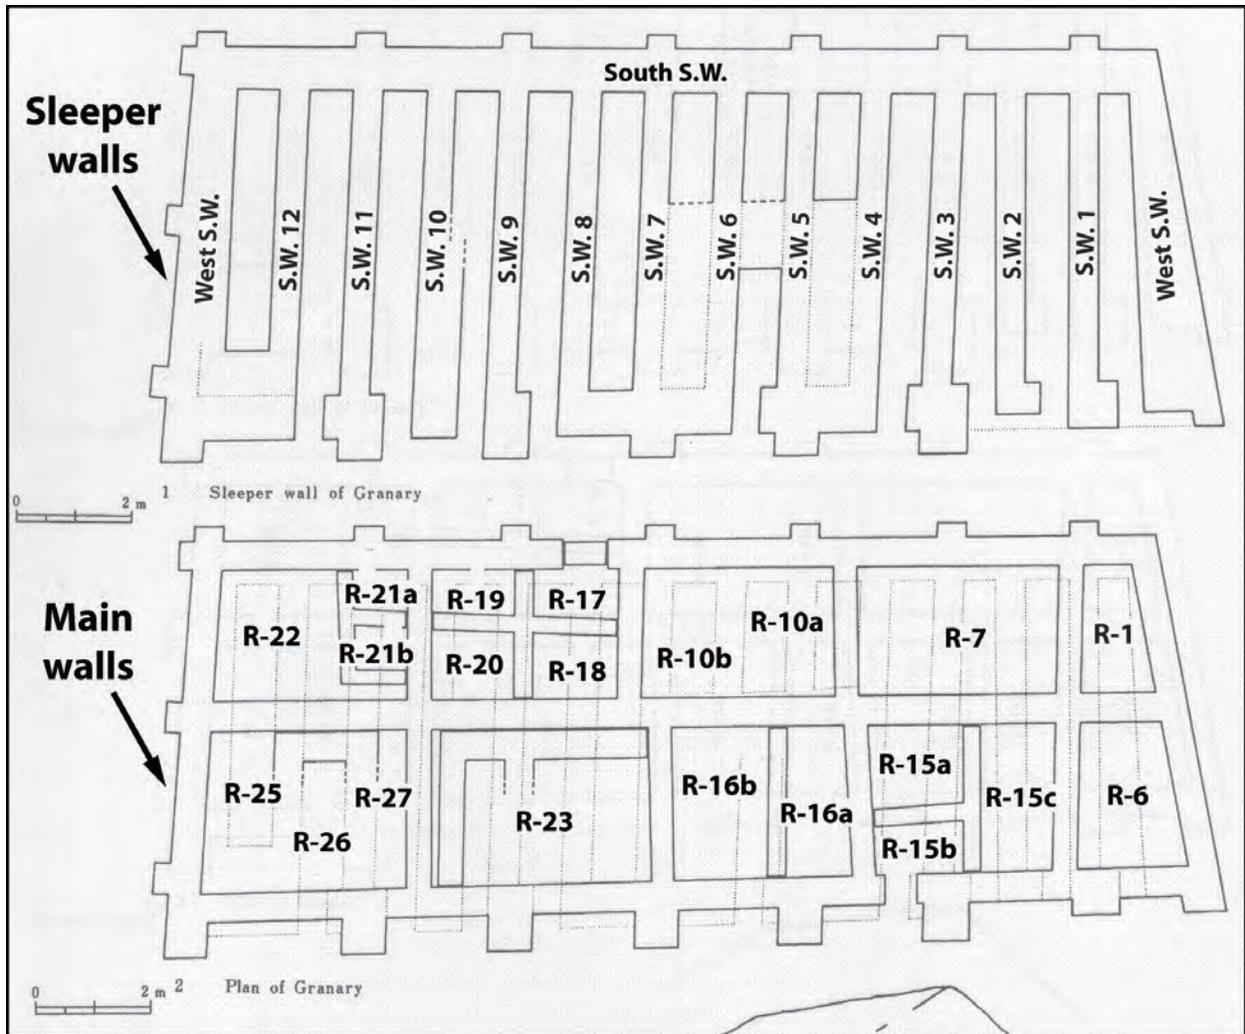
Telul eth-Thalathat, Granary. Schematic plans showing sleeper walls (above; sleeper walls labeled) and main walls (below; rooms labeled). (After Fukai et al. 1974: Plate XLVI)
